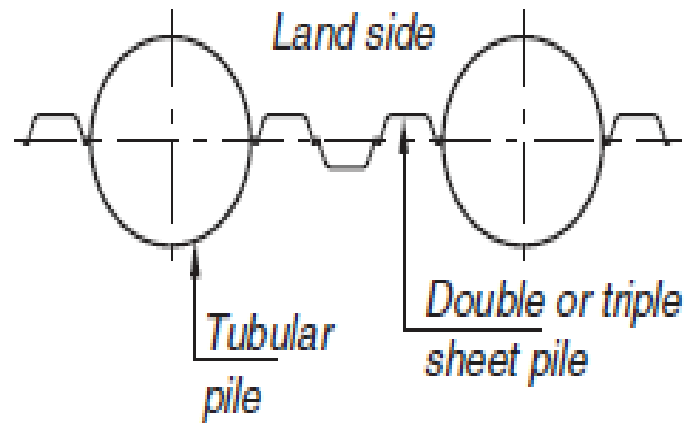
Combined wall with steel tubular piles and triple PU28 sheet piles (De Gijt & Broeken, 2013)
